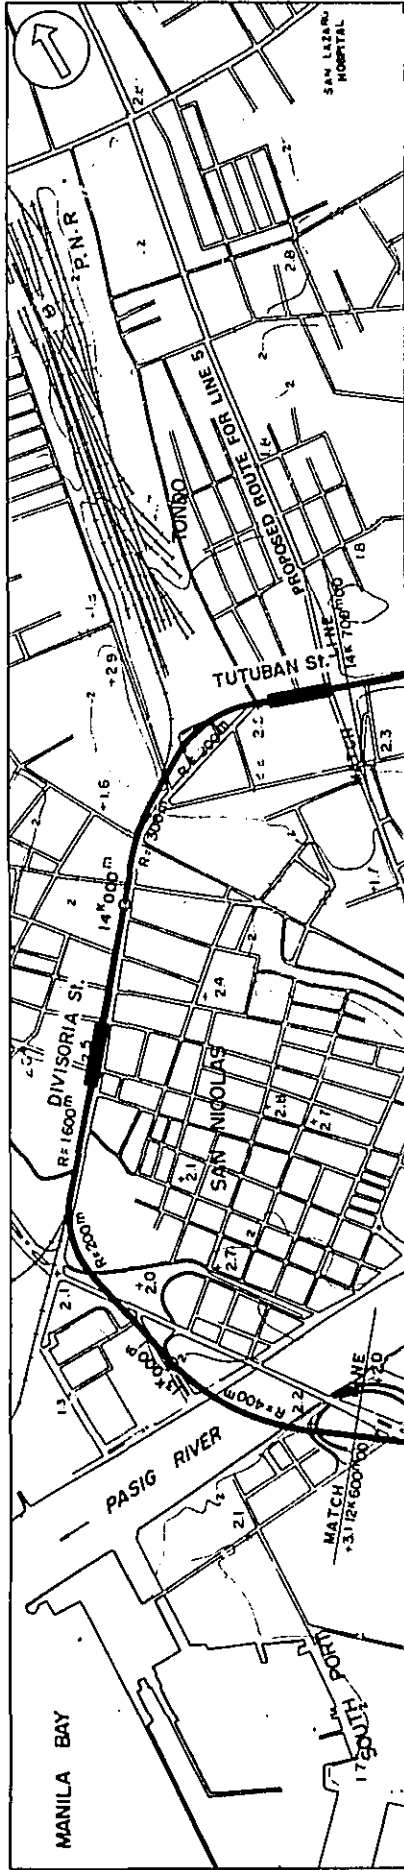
Plan and Profile of Recommended Alternative (4)
